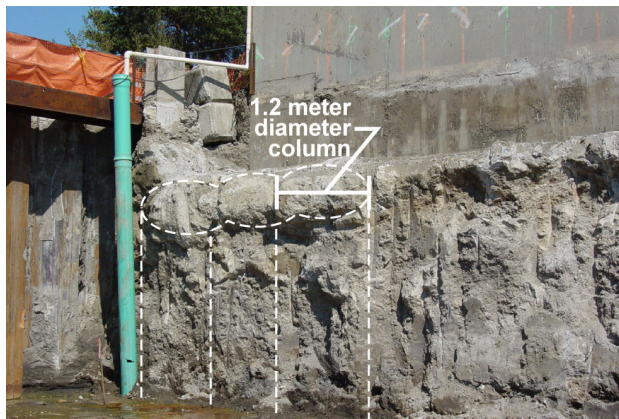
Exposed sedimentation tank underpinning with overlapping 1.2 m diameter triple fluid jet grout columns
